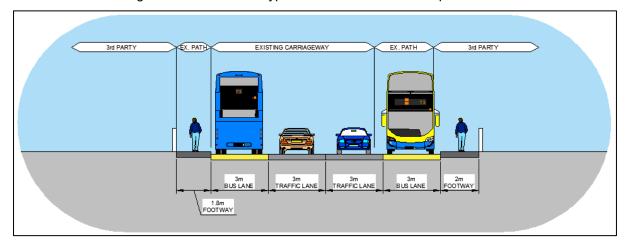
CG1b Typical Cross Section for Crumlin Road
